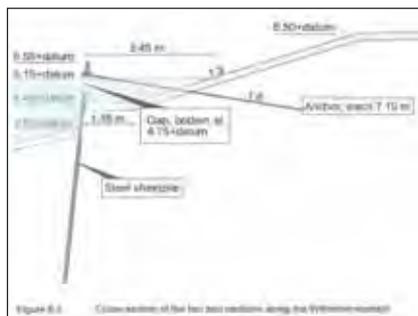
Cross-sections of the test sections along the Willemsoord Canal
